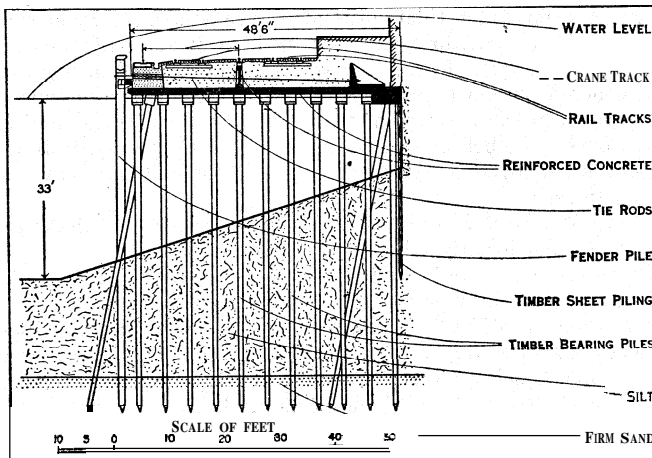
REINFORCED CONCRETE AND TIMBER QUAY AT AMSTERDAM
